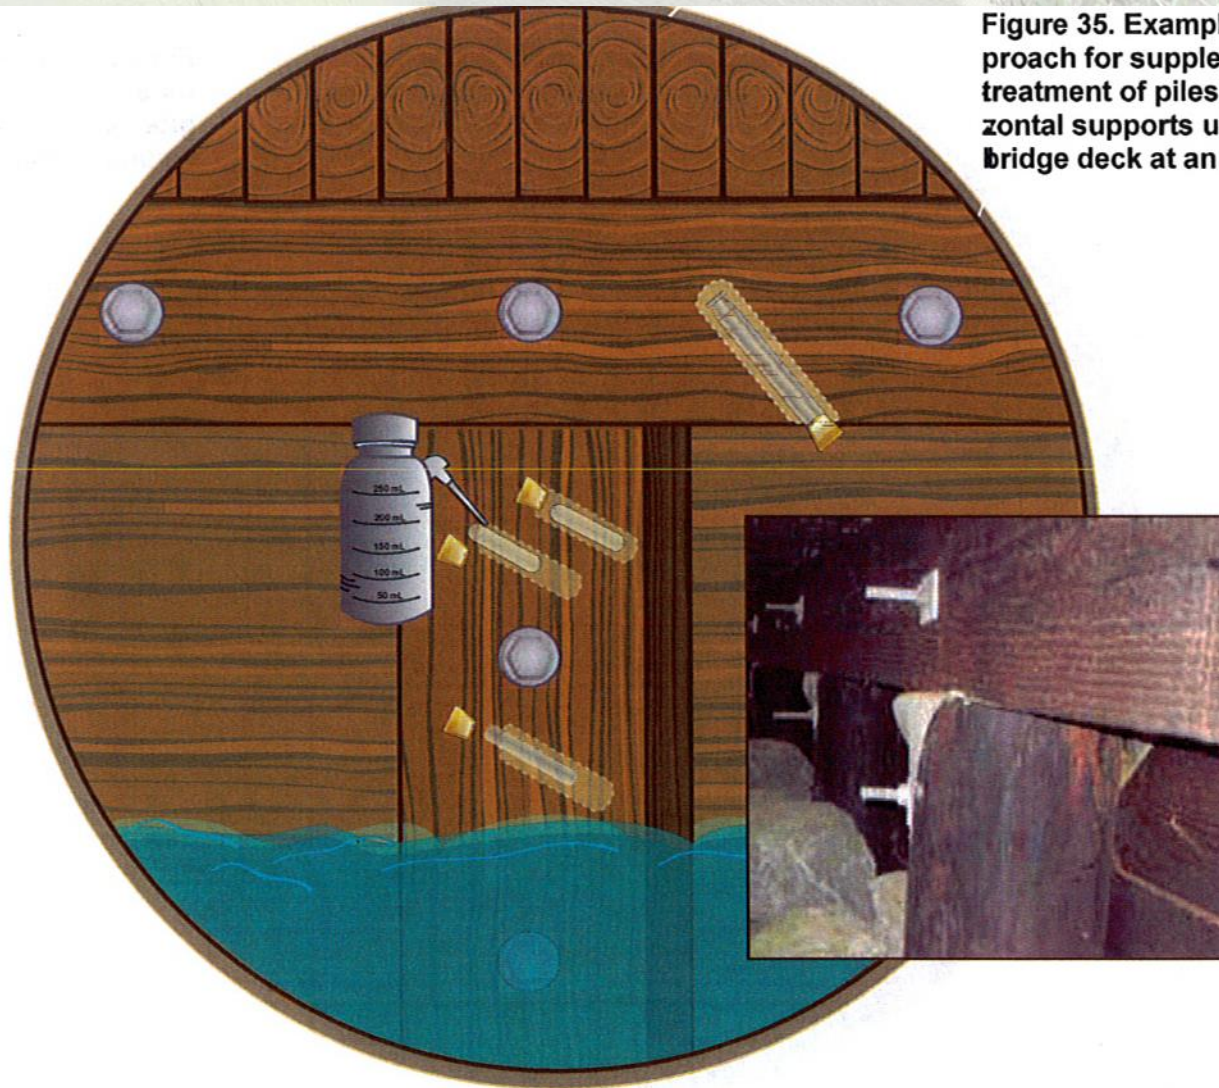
Example approach for supplemental treatment of piles and horizontal supports under the bridge deck at an abutment.
